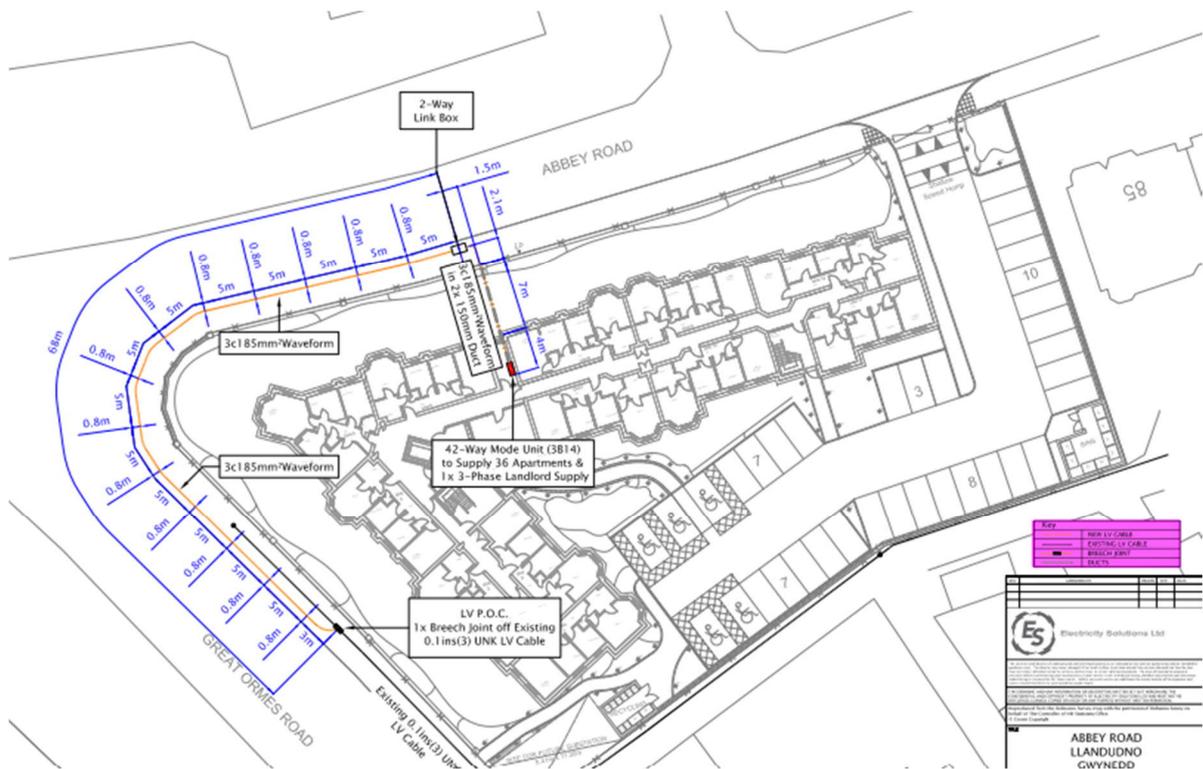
ESP Utilities Group Infrastructure Plan
